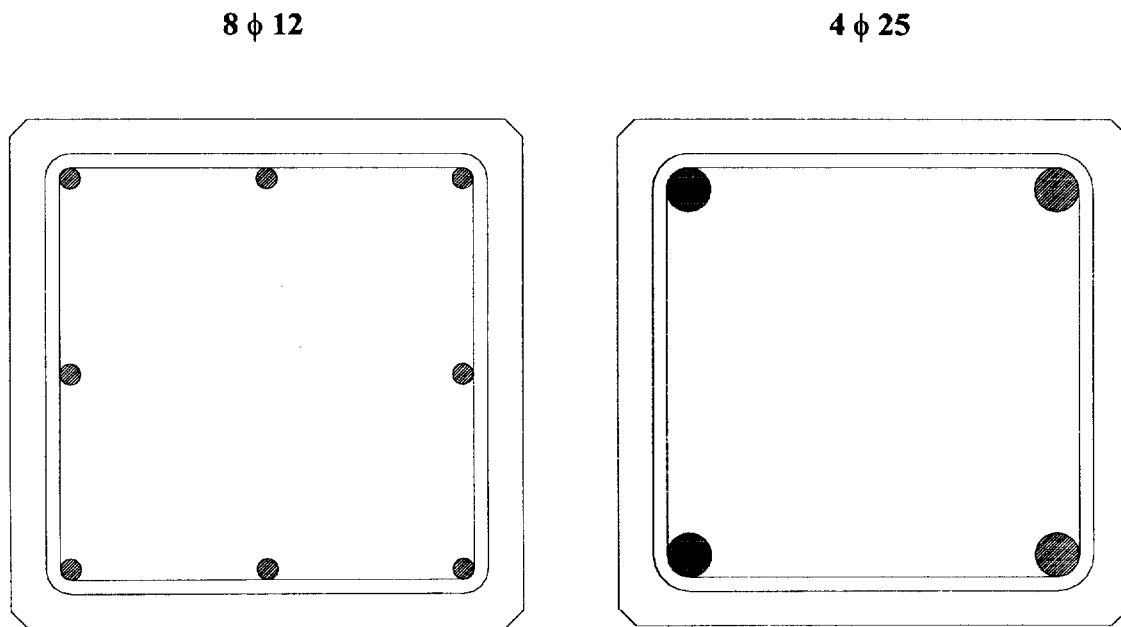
Concrete cross sections (29 cm x 29 cm); longitudinal reinforcement  $8 \phi 12$  mm and  $4 \phi 25$  mm. Concrete cover 3 cm
